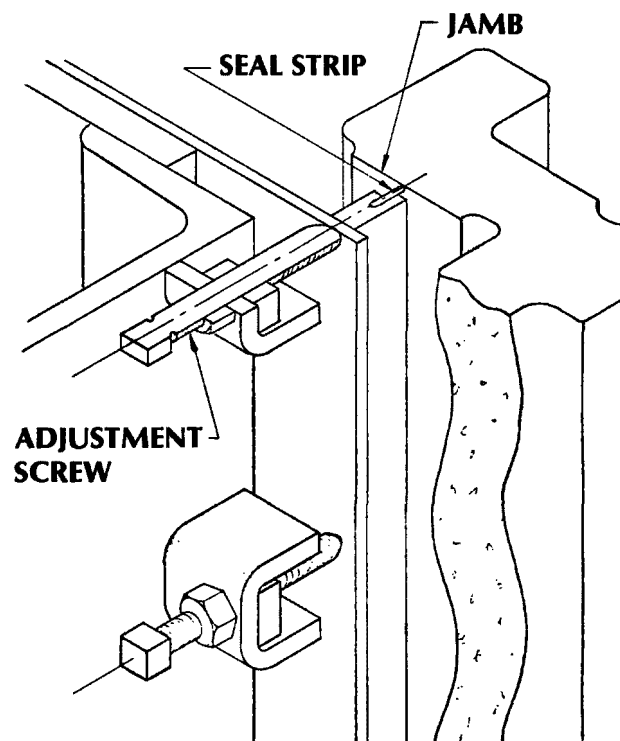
SIDE VIEW OF ADJUSTMENT EQUIPMENT ON FIXED-EDGE SEALS
